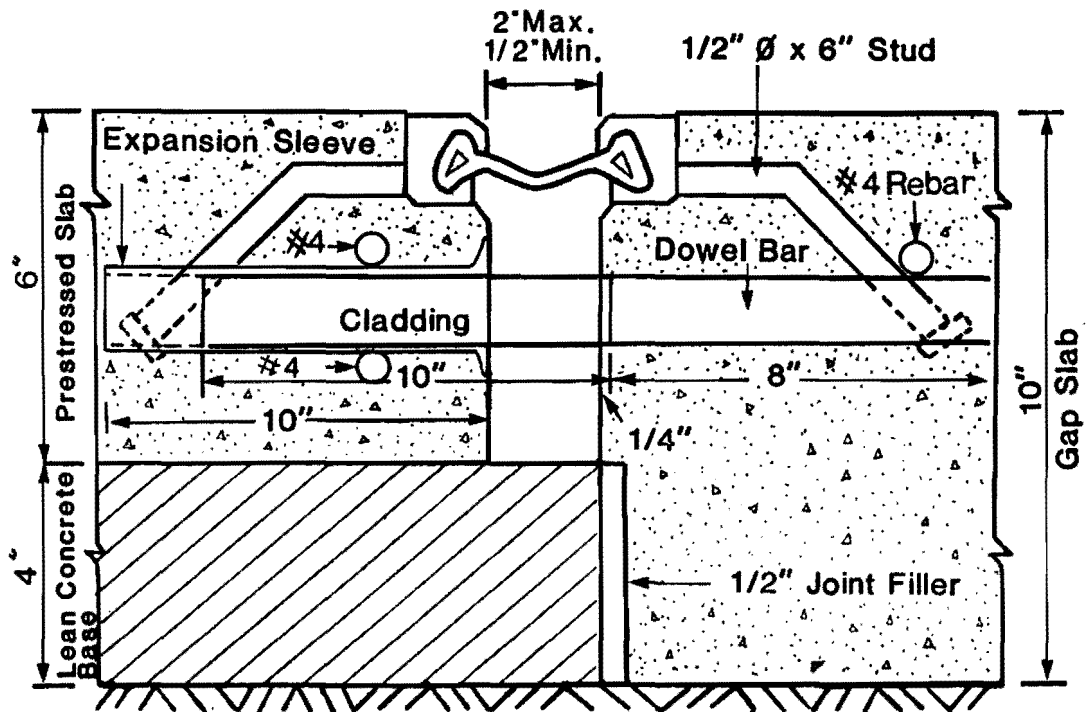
Typical joint assembly at load transfer dowels (Ref 68).
